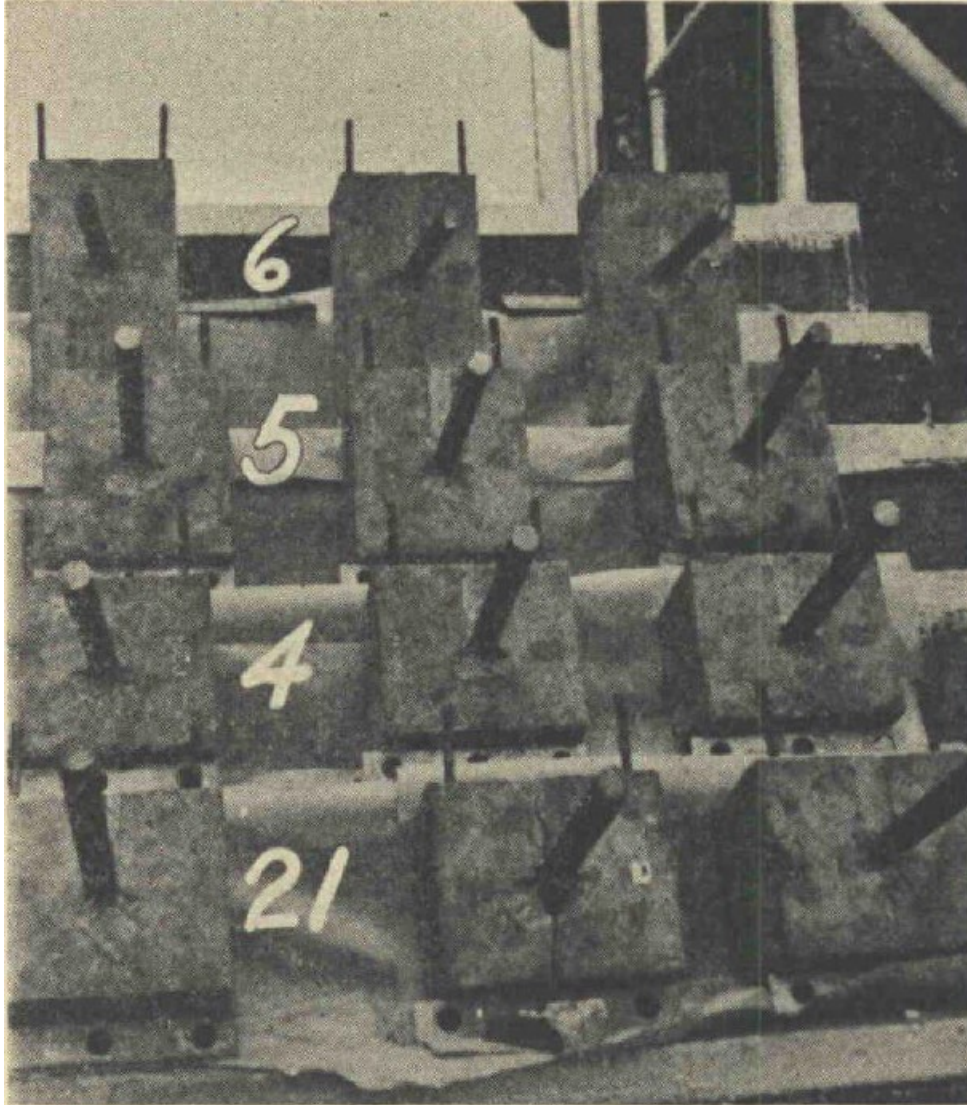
Photo. Specimens from laboratory testing of dowel bars showing typical failures around dowel bars (Friberg 1938).
